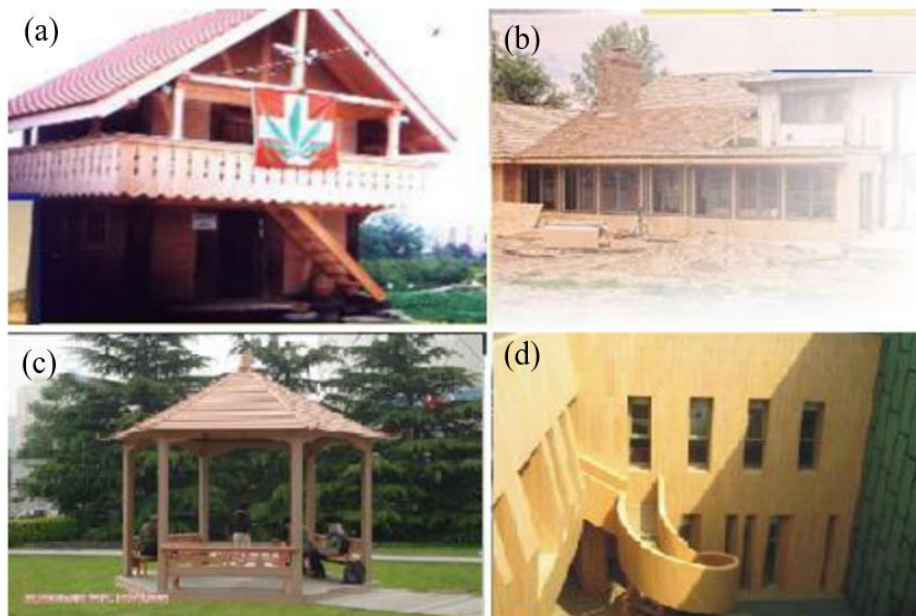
Building applications made from NFRCs; (a) traditional house, (b) roofing, (c) roof tiles, (d) exterior wall cladding (Renato Barboni 2015).
